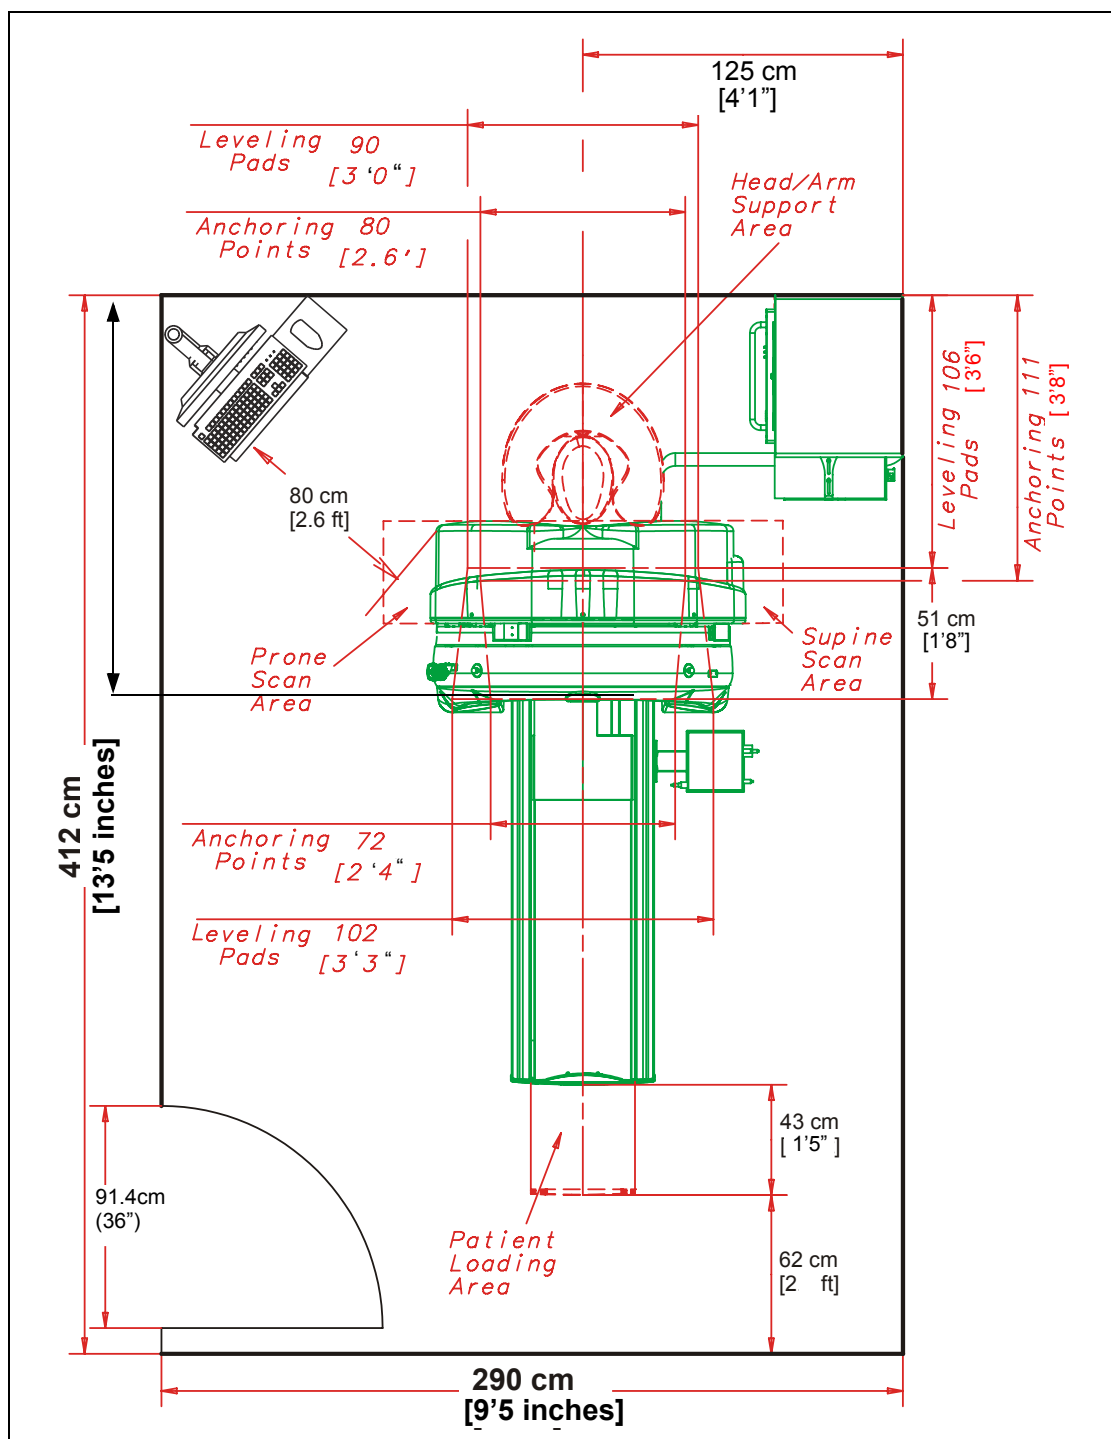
Recommended Room Layout - Wall Mounted Computer Console
